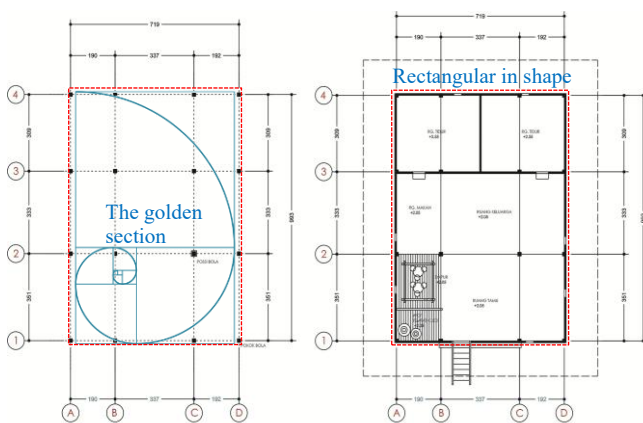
Siring's* ground floor plan (3a) and *Kale Balla's* first floor plan (3b)
